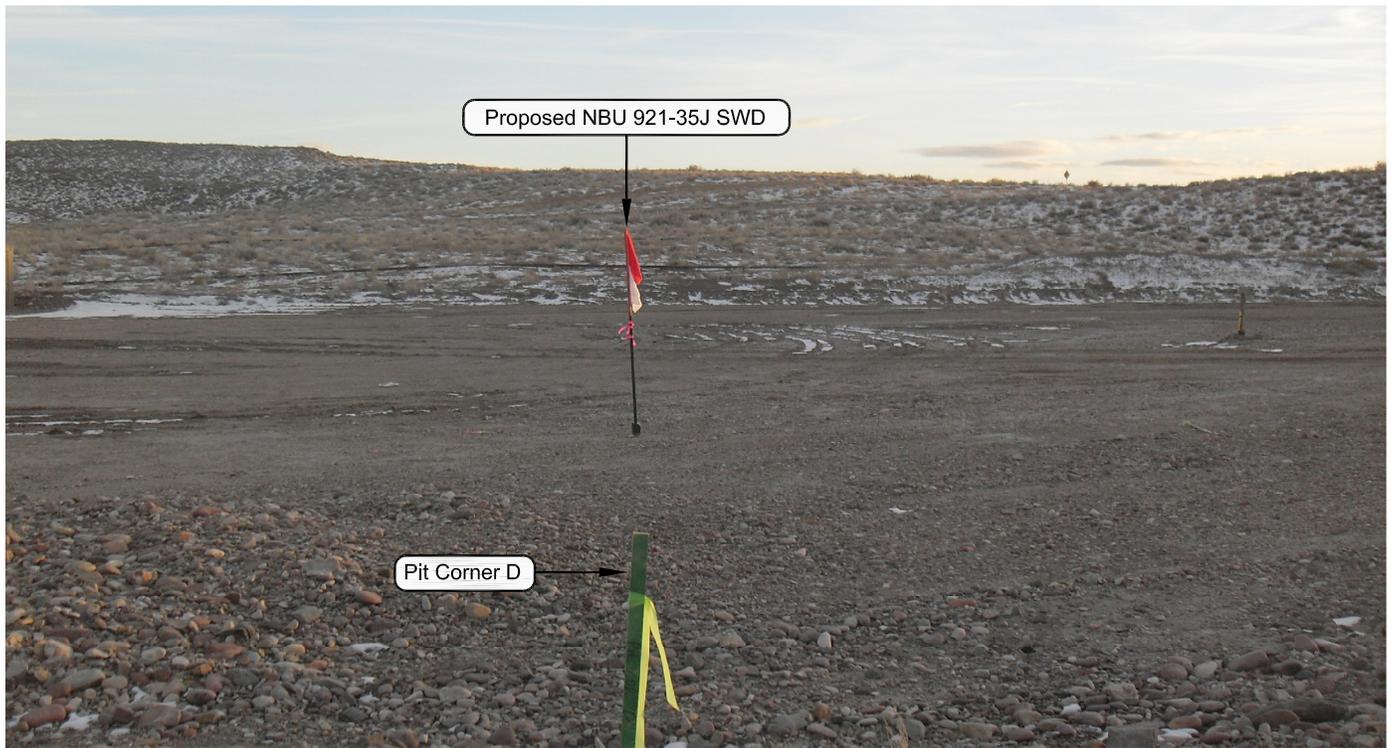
PHOTO VIEW: FROM PIT CORNER D TO LOCATION STAKE
